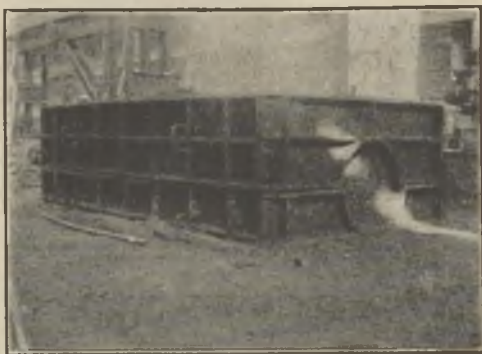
BOX PARTS USED FOR MAKING PIPES. EACH PART IS 15 FT. \times 8 FT. \times 2 FT. 8 IN.
